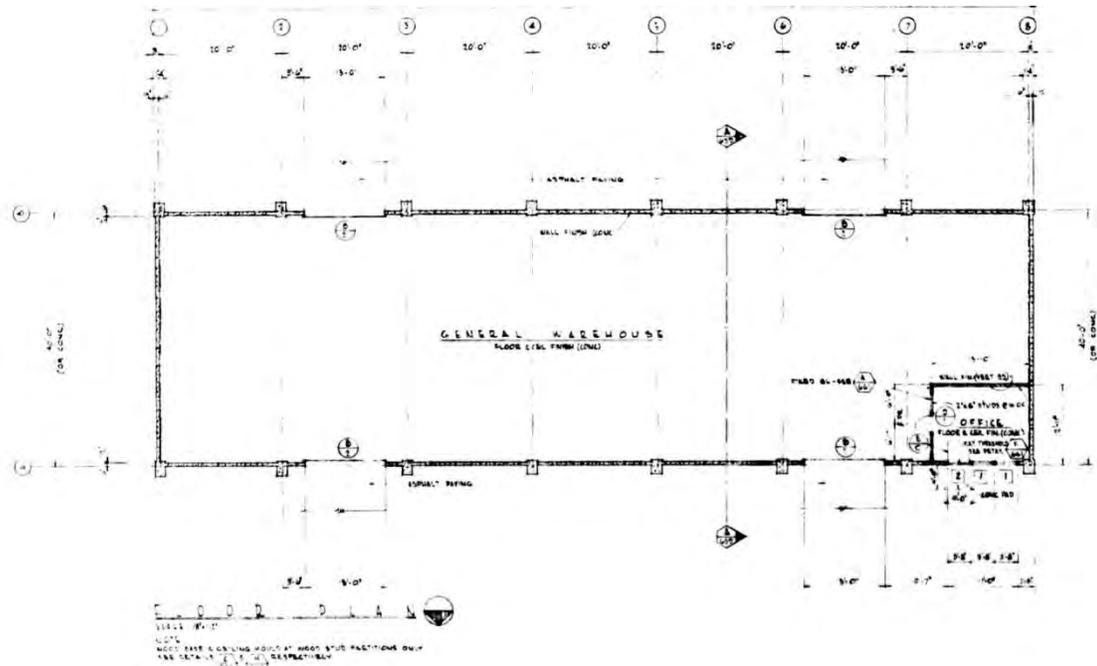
As Built plan view of NTTU general warehouse, Feature 11b.
